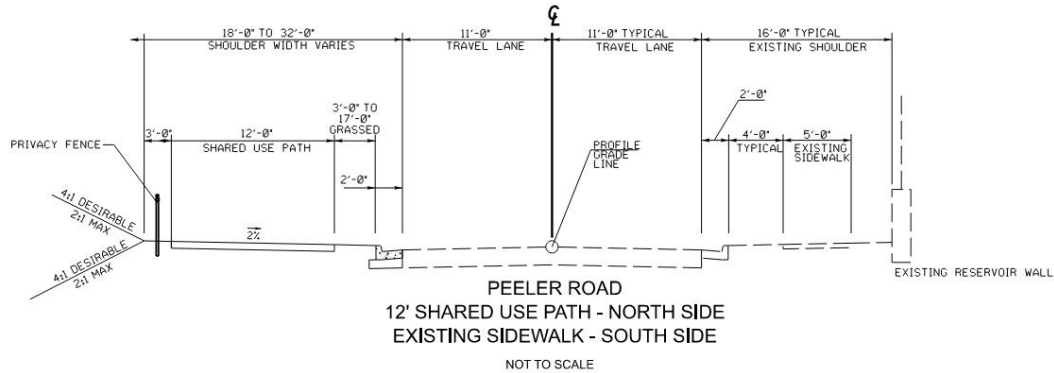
Typical Section – Shared Use Path on the north side and existing sidewalk on the south side of roadway (looking east)
